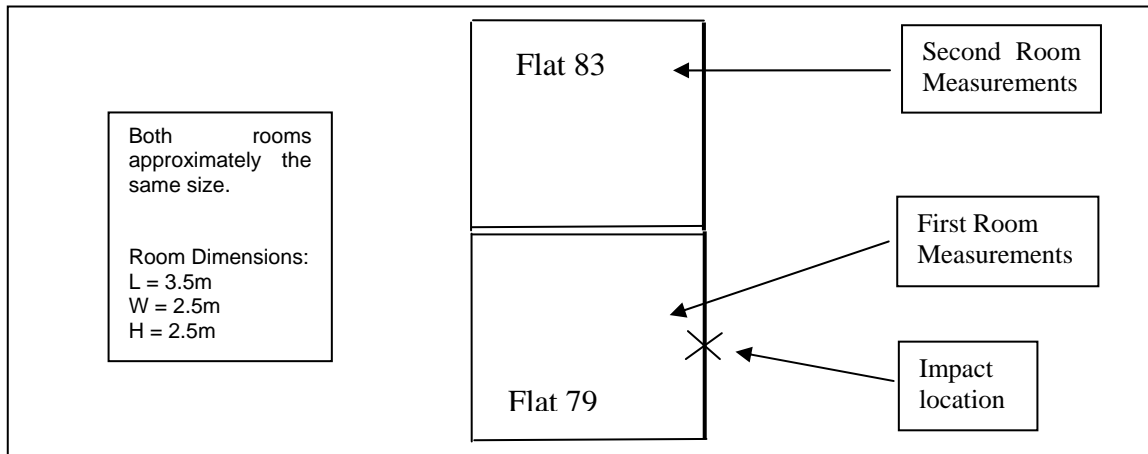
Sketch of test location at test site 2. Elevation view of ground and first floor.
